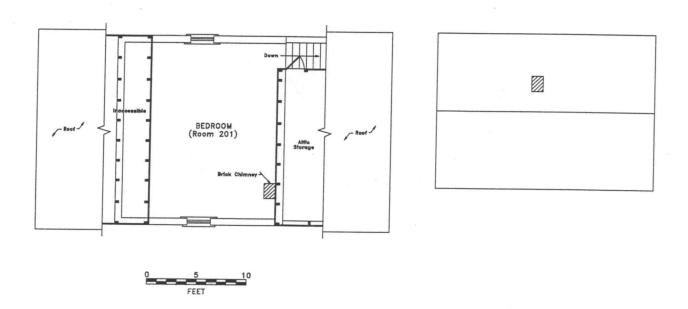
Second floor plan of the Allard House, after the construction of the brick-nogged addition (ca. 1850-60).
